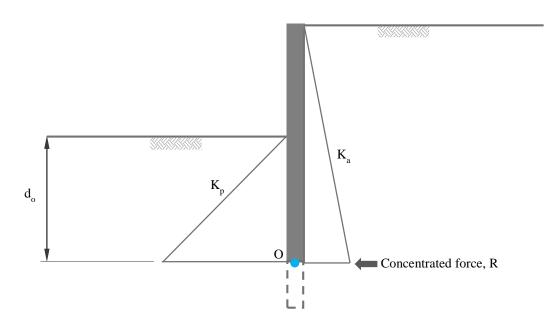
Simplified Soil Pressure Distribution on a Cantilevered Wall Based on a
